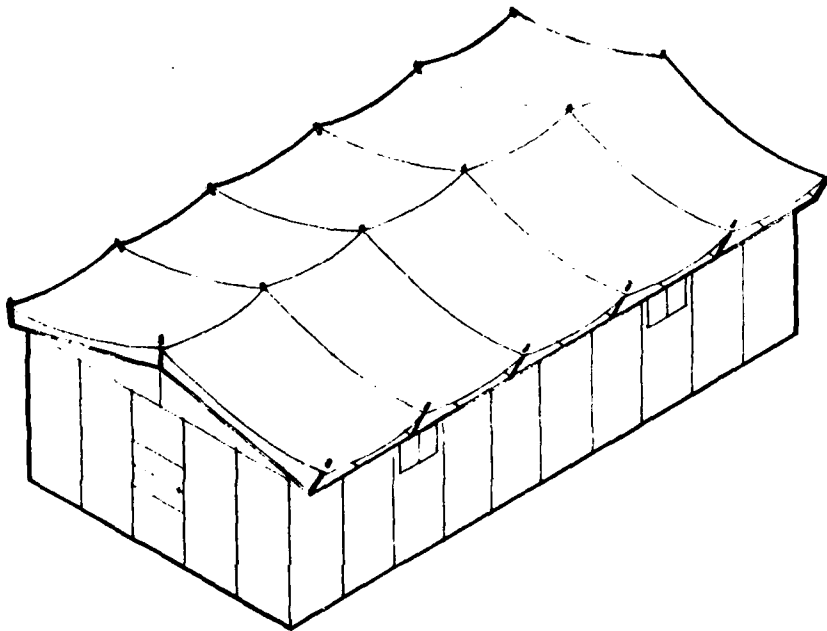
Test structure 1--fiberboard building with fabric roof (20 x 8 x 40).
